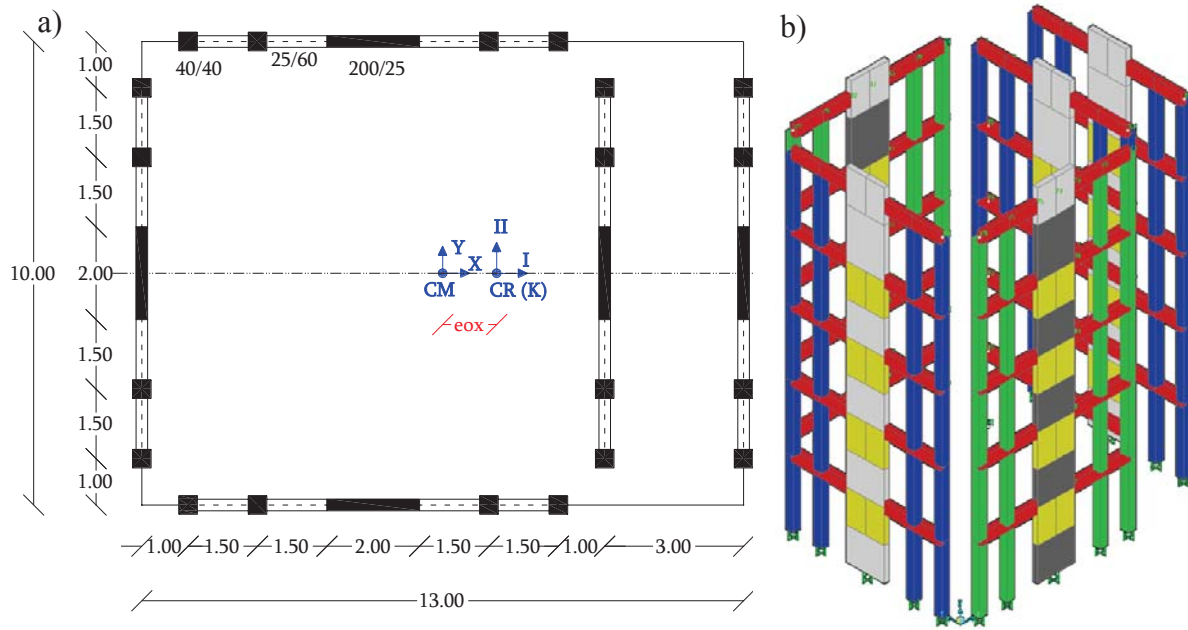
Five-story isotropic building: a) plan view; b) finite element model.
